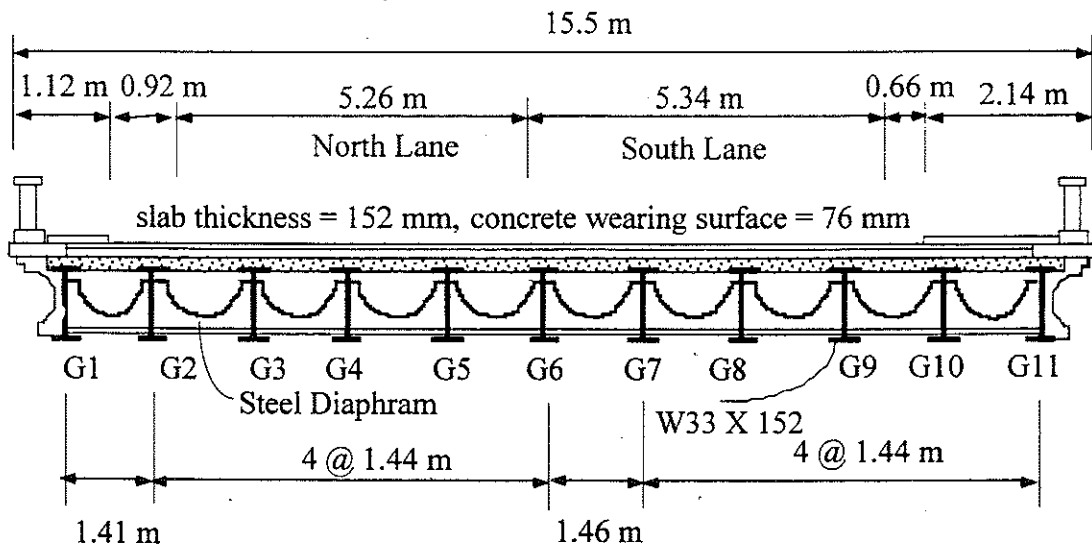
Cross-Section of Bridge M34/RR in Adrian.
